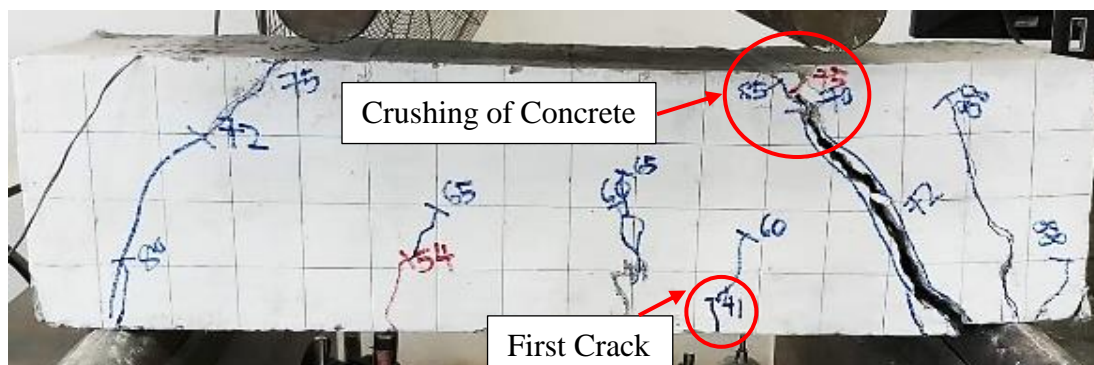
First crack and Crushing of NWRC-W/OS Beam
